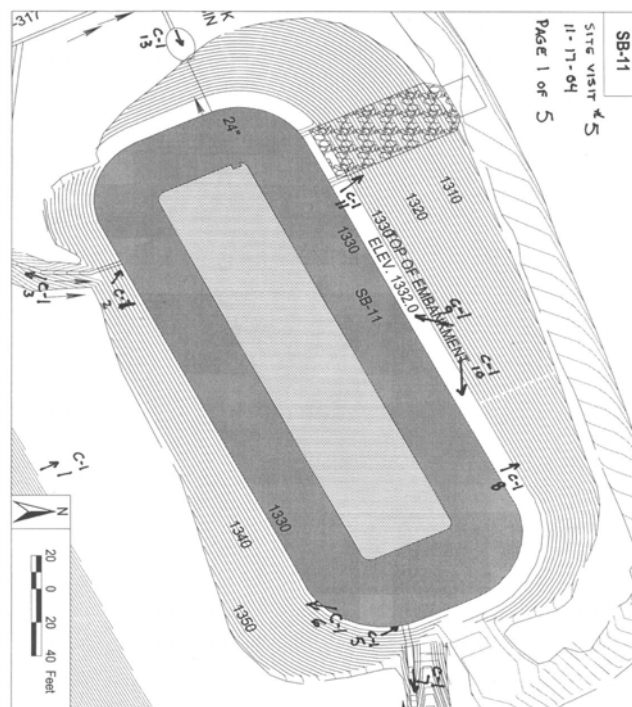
Elevation of SB11 showing basin topography inlets and outlet
